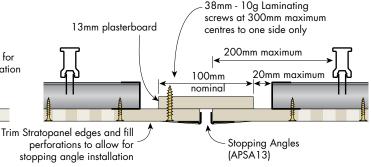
Control Joint - Stopping Angles Perpendicular to furring channel Section
